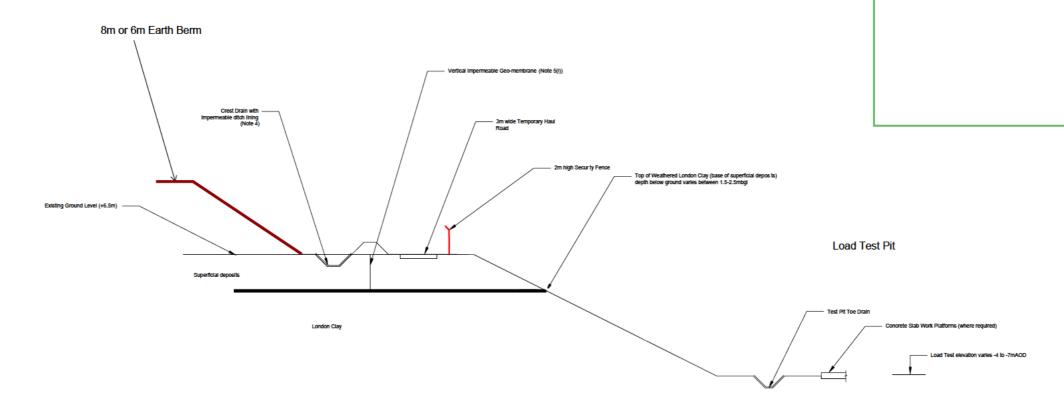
Typical Section of Test Pit and Surcharge Test Earth Berm
